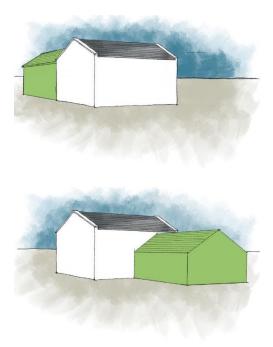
Some simple examples of extension locations, forms and shapes that can work with existing dwellings.
